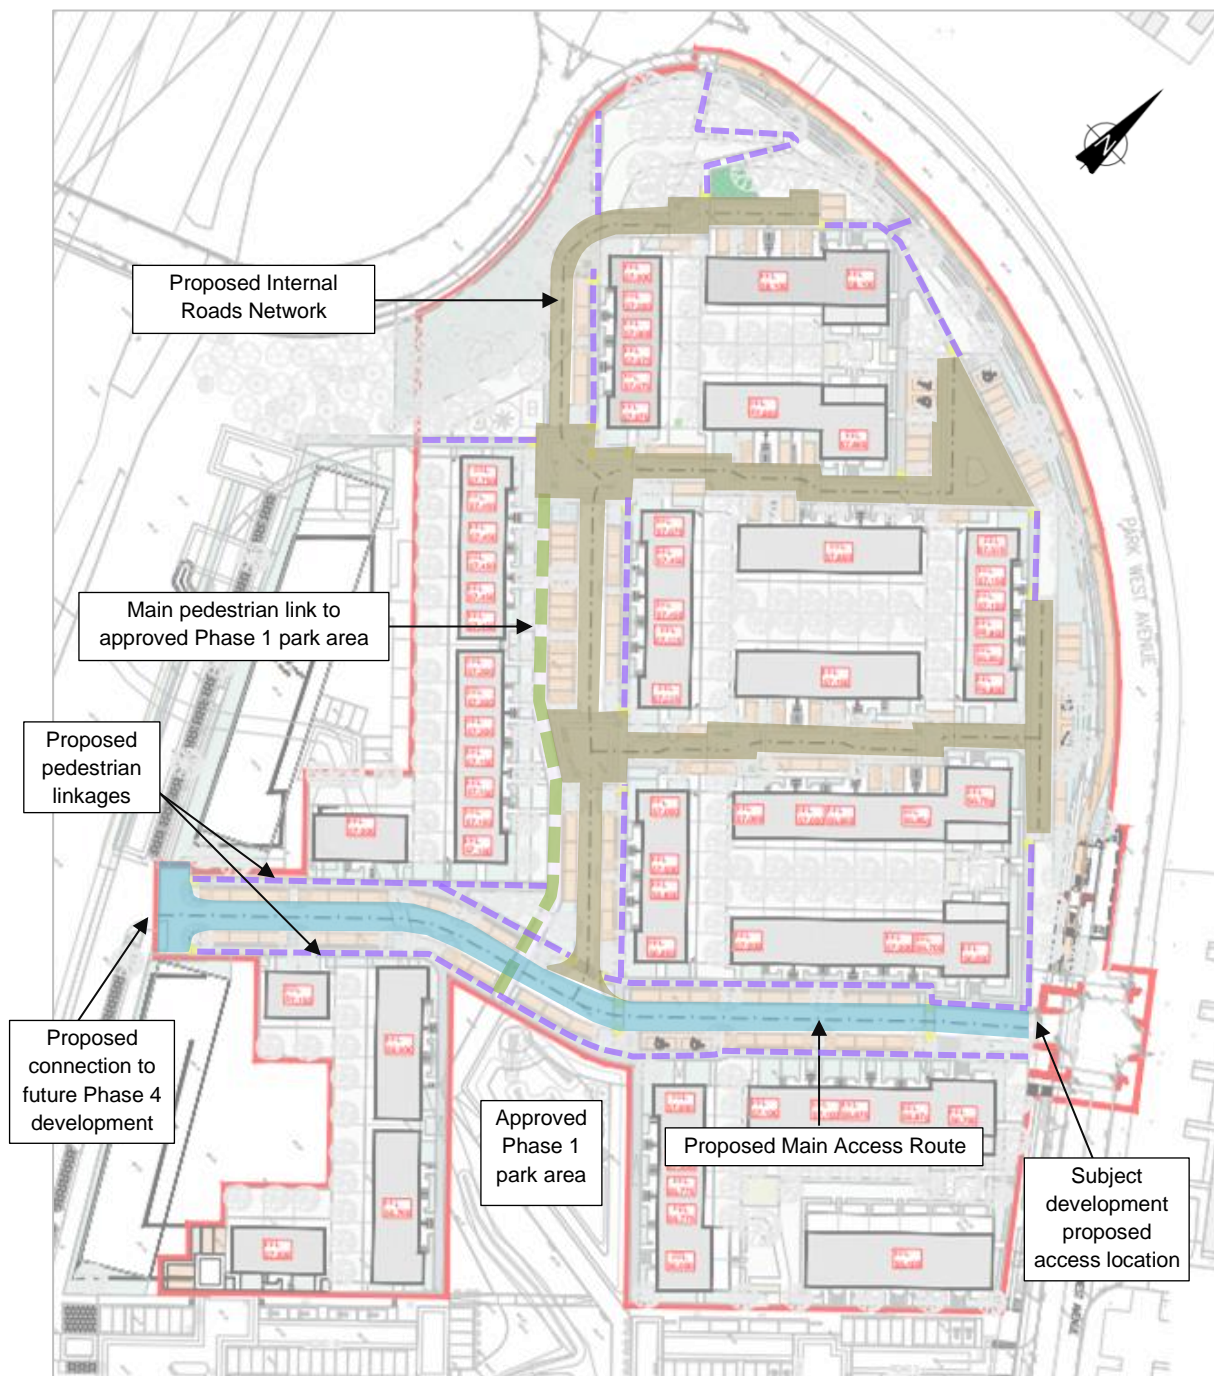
Extract of Phase 2 Site Layout Showing Internal Roads Network
